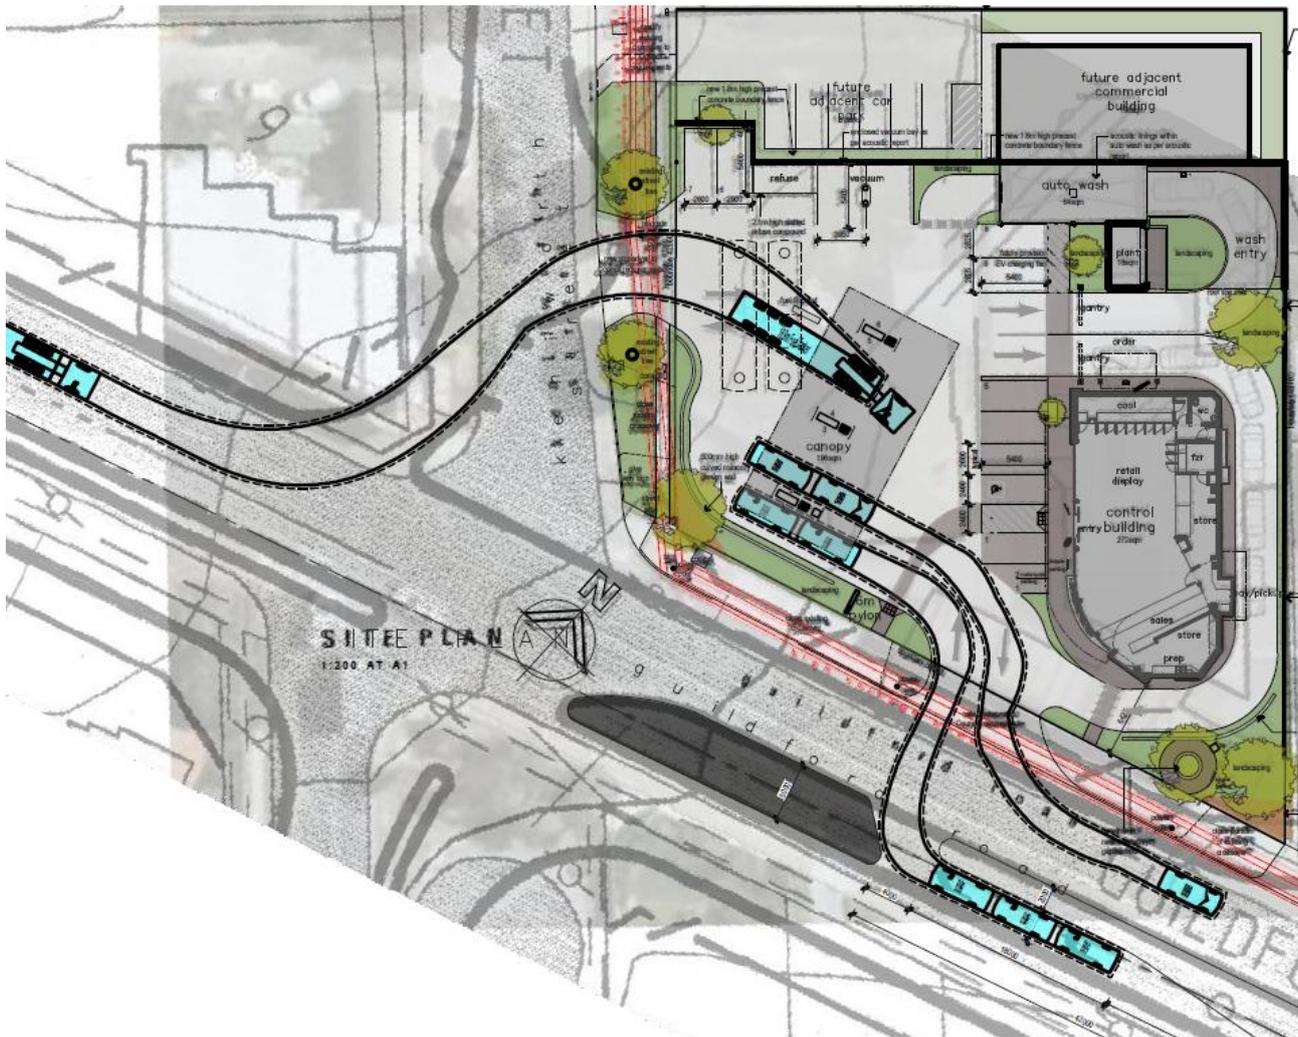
Swept path assessment of B99 Design Cars with ‘PCI Right turn IN’ option and 16.9 m Fuel Tanker accessing site via proposed Kenilworth cul-de-sac as part of the Mian Roads WA widening project
